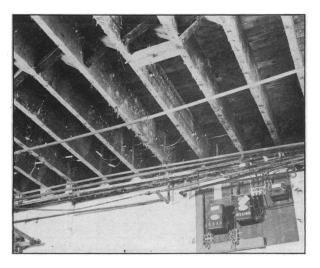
BASEMENT CEILING BEING REMOVED TO DESTROY RAT HARBOR EXISTING BETWEEN THE BASEMENT CEILING AND THE FLOOR ABOVE.
